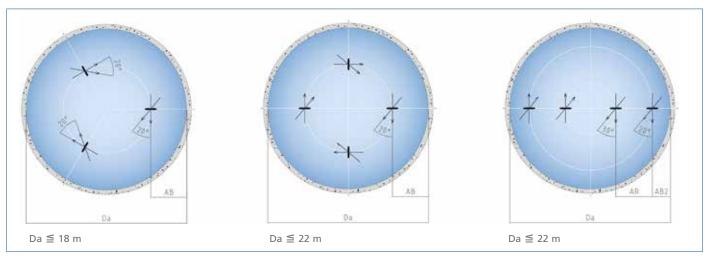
Round tanks | Stormwater overflow tanks (floor drainage in the middle of the tank)
